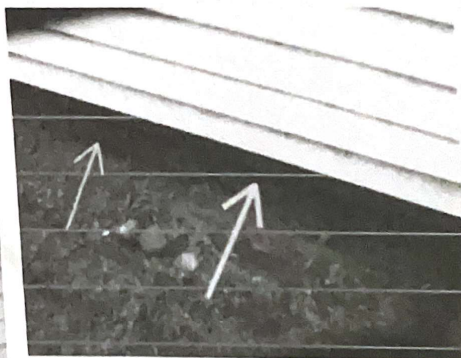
Brick foundations are no longer used. This foundation is failing and tilting outward and dangerous.
